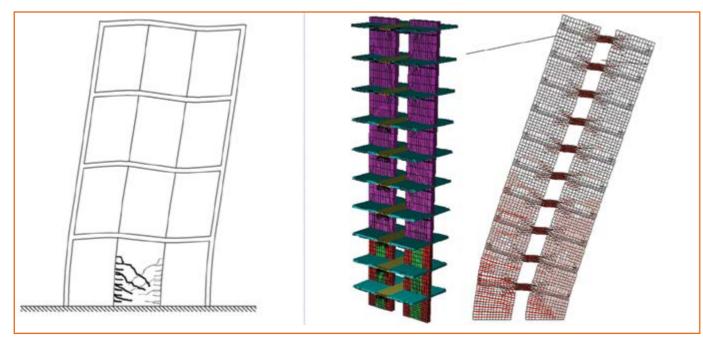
Structural interaction between wall and floor systems. Left, a single cantilever wall. Right, a coupled wall system.
